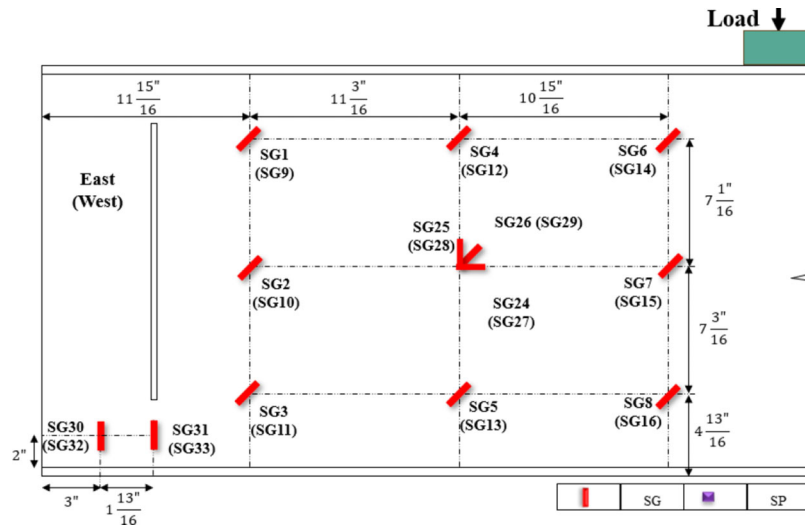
Strain gauge layout (side elevation): Specimens 1–6.
